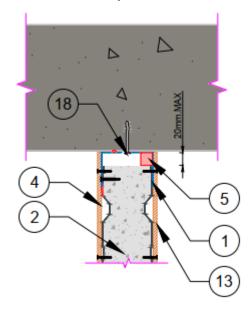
Dual wall system with vertical wall between horizontal walls – horizontal head detail – option 02
